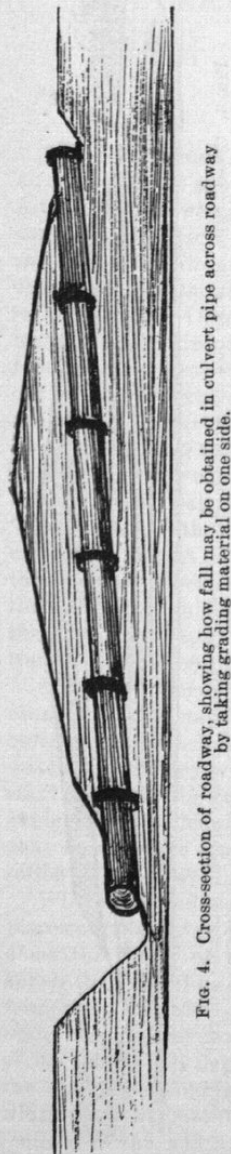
Cross-section of roadway, showing how fall may be obtained in culvert pipe across roadway by taking grading material on one side.
